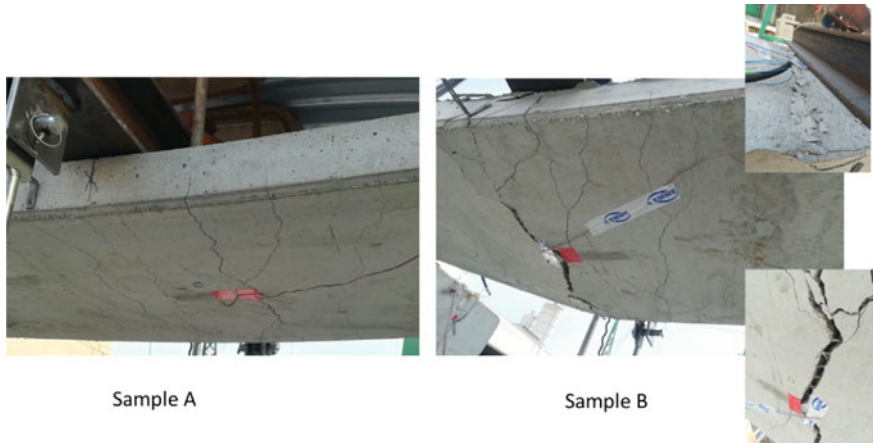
Crack patterns of the tested samples (details on the right are referred to top and bottom of Sample B)
